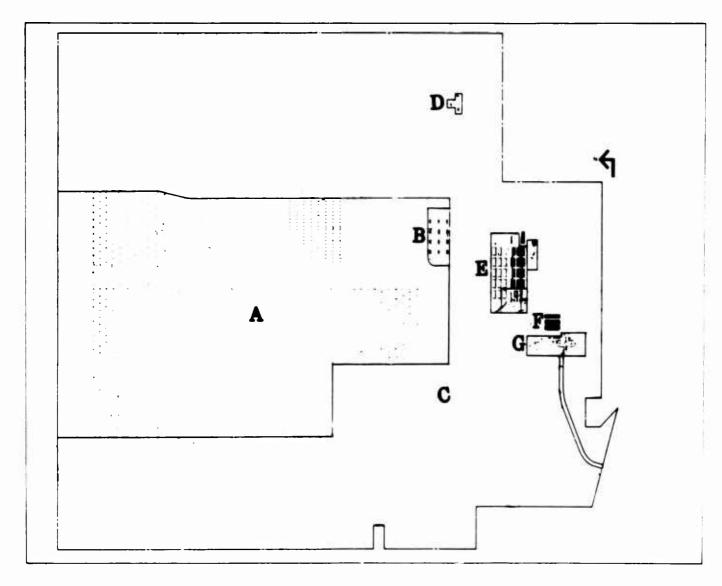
Area plan of Pueblo Depot Activity. (Source: Adapted from unpublished drawing 18-02-06, 1981, PUDA Facilities Engineer's Office.)
